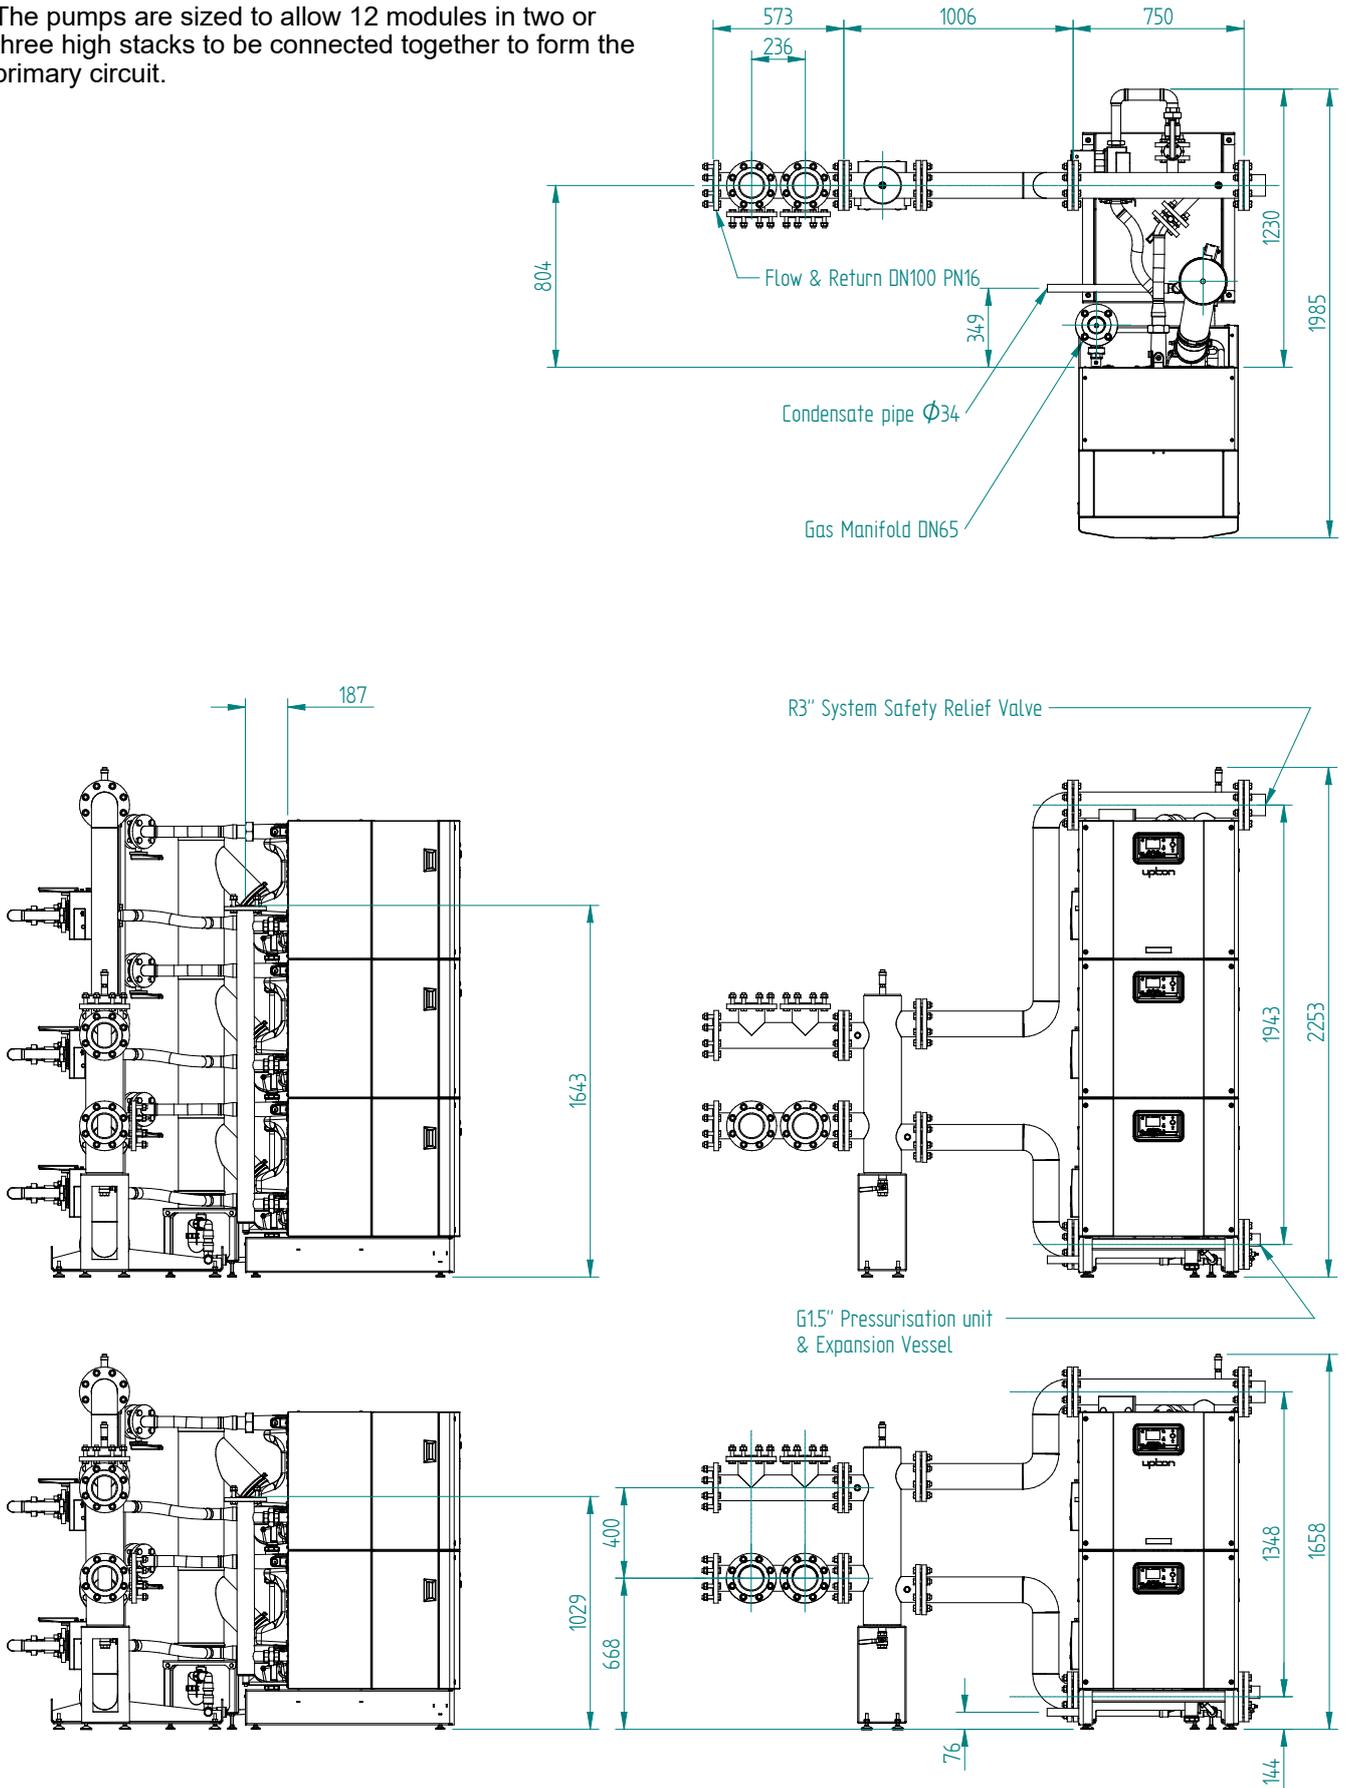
UF100 & UF150 2MW Primary circuit and Gas manifold pipe kit
